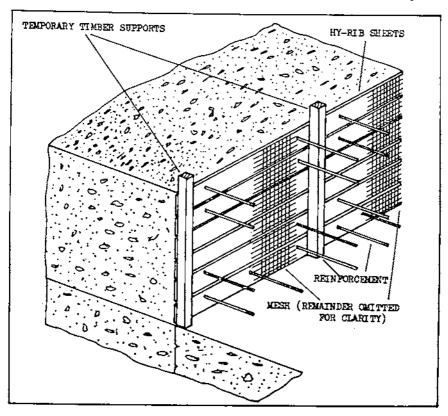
View of Hy-Rib Sheets Providing Keyed Shutter for Construction Joint.
